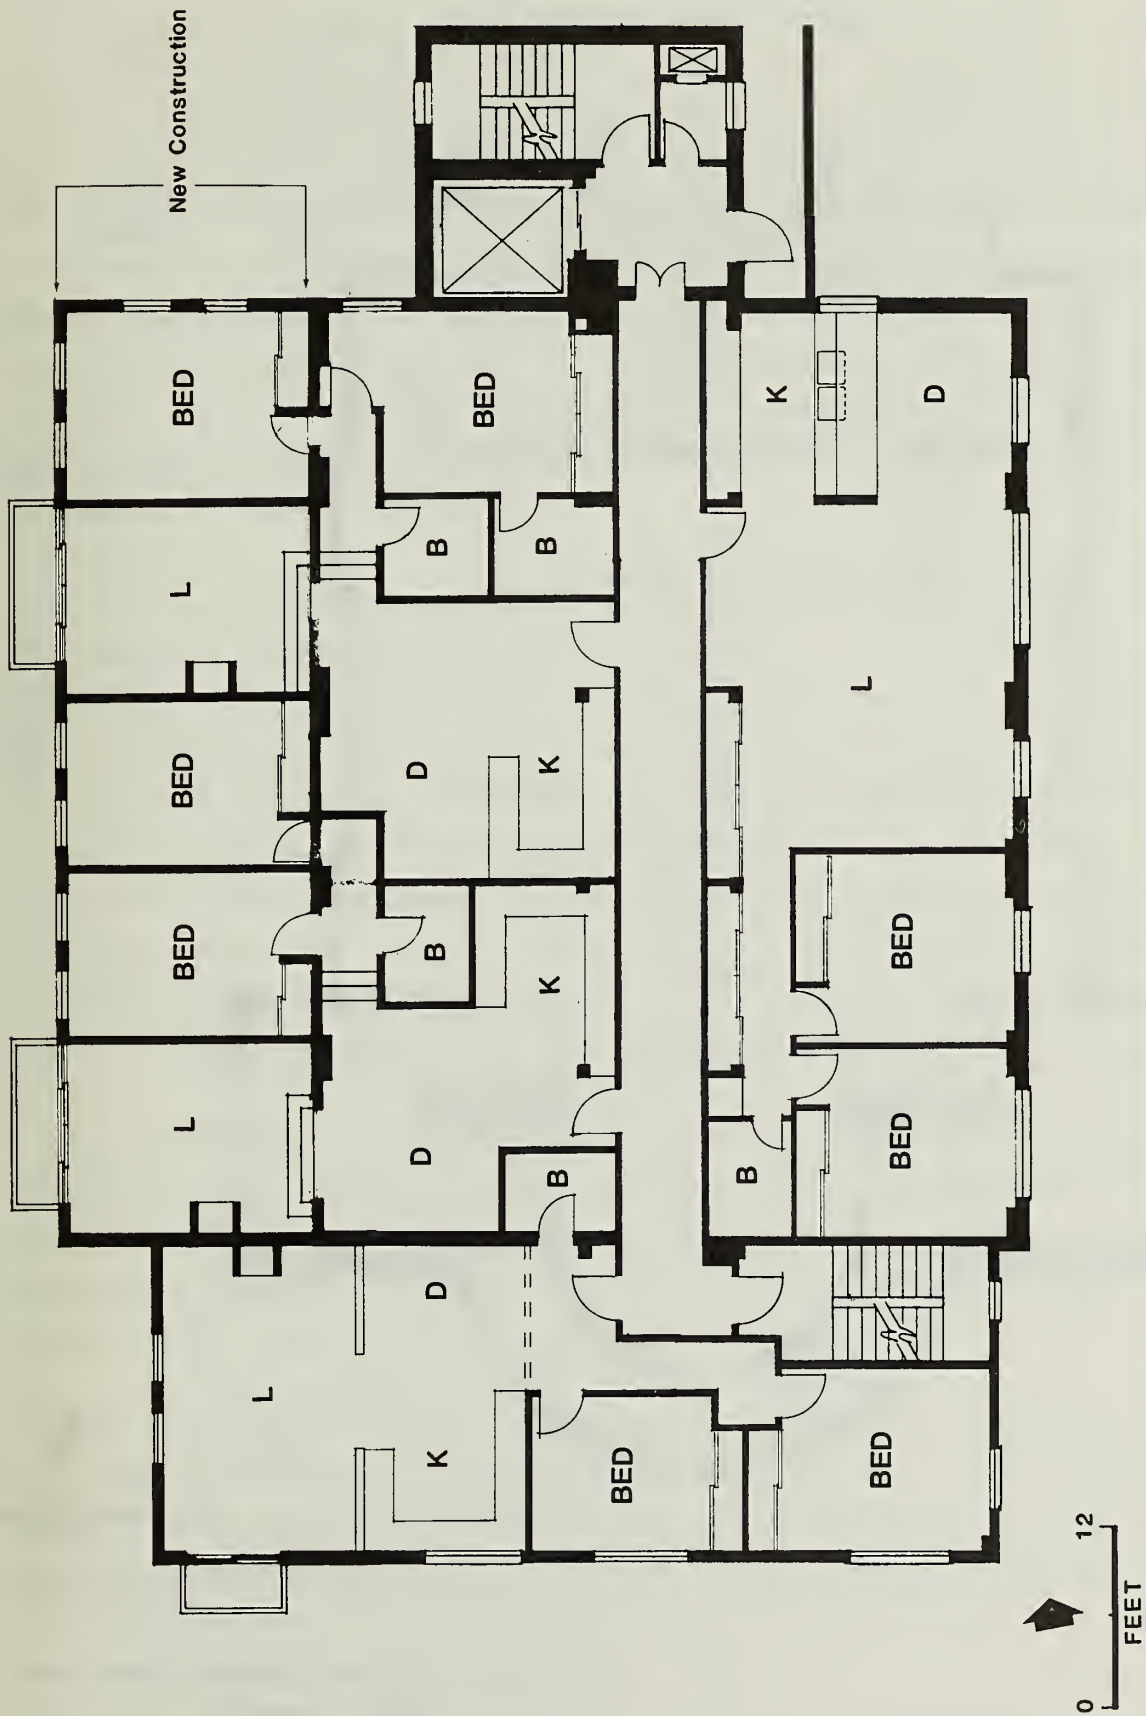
Convent Building Floor Plan (Typical Upper Floor)
